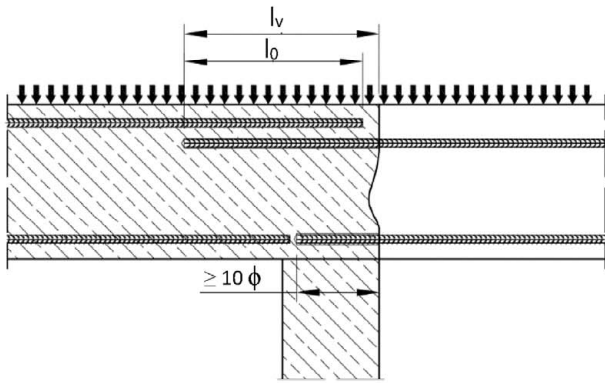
Overlapping joint at a foundation of a wall or column where the rebar are stressed in tension
